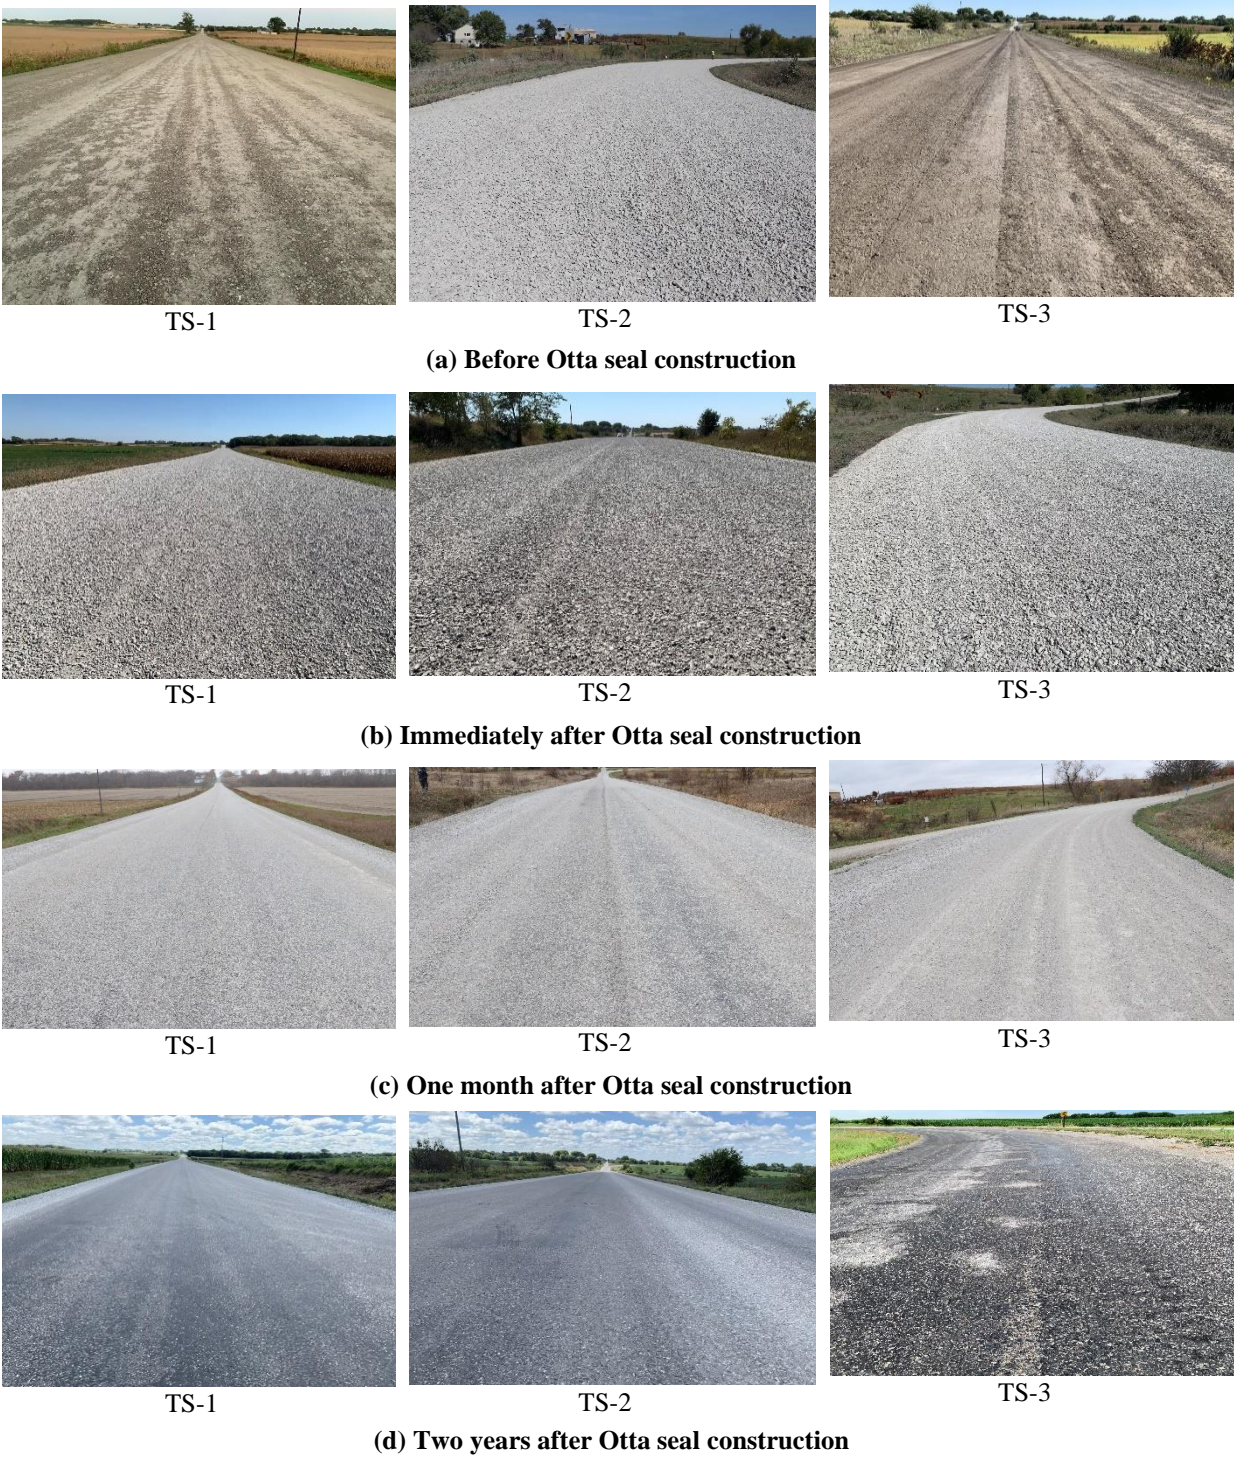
Surface conditions of test sites on County Road J55 (a) before Otta seal construction, (b) immediately after Otta seal construction, (c) one month after Otta seal construction, and (d) two years after Otta seal construction
